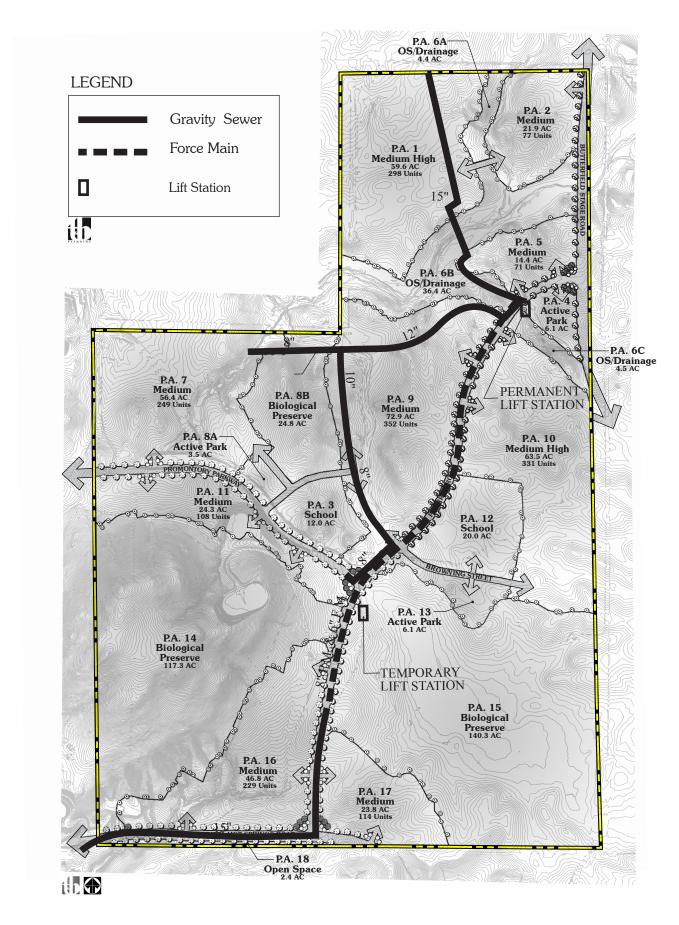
MASTER SEWER PLAN developer shall submit information to the EMWD which describes estimates of the project's reclaimed water demand, and landscape/irrigation conceptual plans to EMWD for review. At the time of EMWD's review, a determination shall be made regarding the feasibility and requirements for reclaimed water use and system improvements by RANCHO BELLA VISTA.
